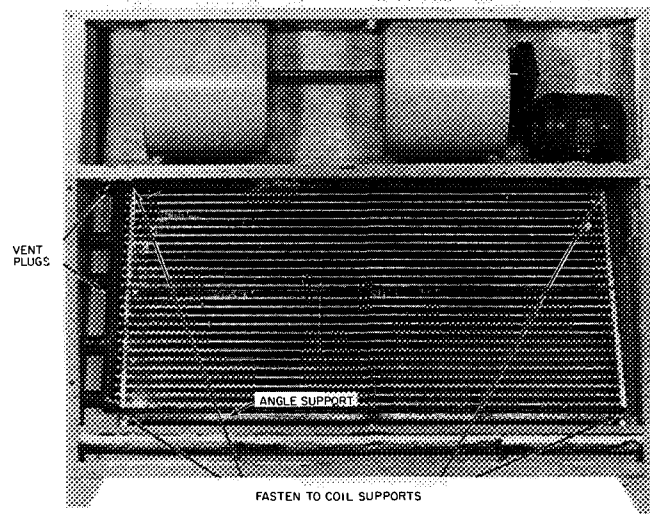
Hot Water Coil Mounted Unit with Back Panels Removed (Typical for 40RR016,024)
